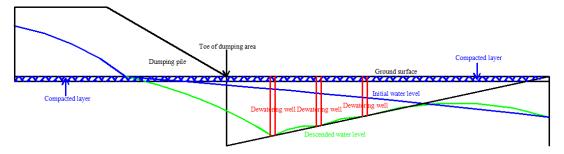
Dewatering well in the floor close to toe of dumping area and a compacted layer is formed in the floor
